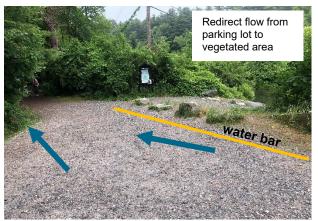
Stormwater flows from gravel parking lot towards the boat launch or to the vegetated area near the trailhead.
